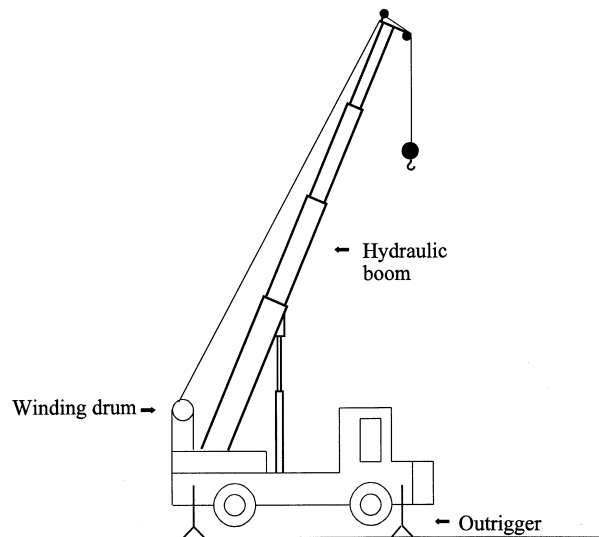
Simple illustration of a mobile truck with hydraulic boom, outriggers deployed.
